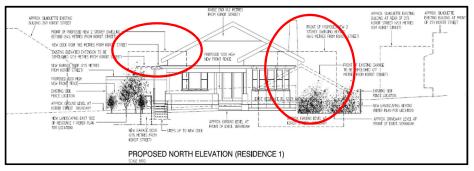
Proposed Front Elevation with red circles highlighting outline of proposed dwellings upper storeys. Source: Application Documents.
